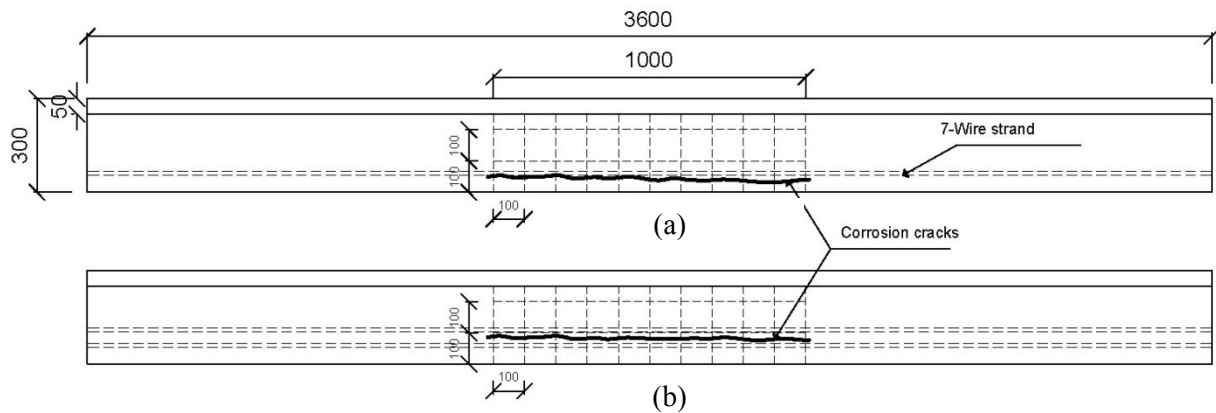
Typical corrosion induced cracking in (a) beams with a single strand, and (b) beams with two strands
